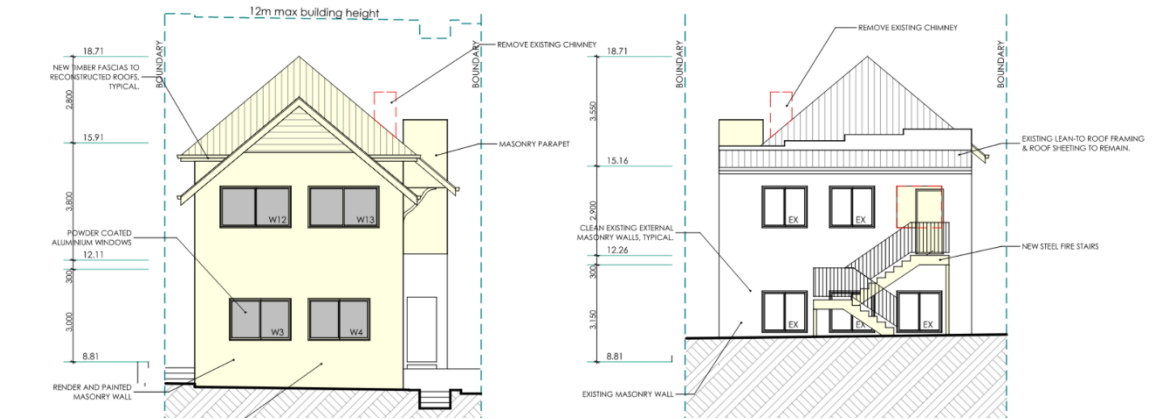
Proposed north and south elevations (Source: Brad Inwood Architects)
